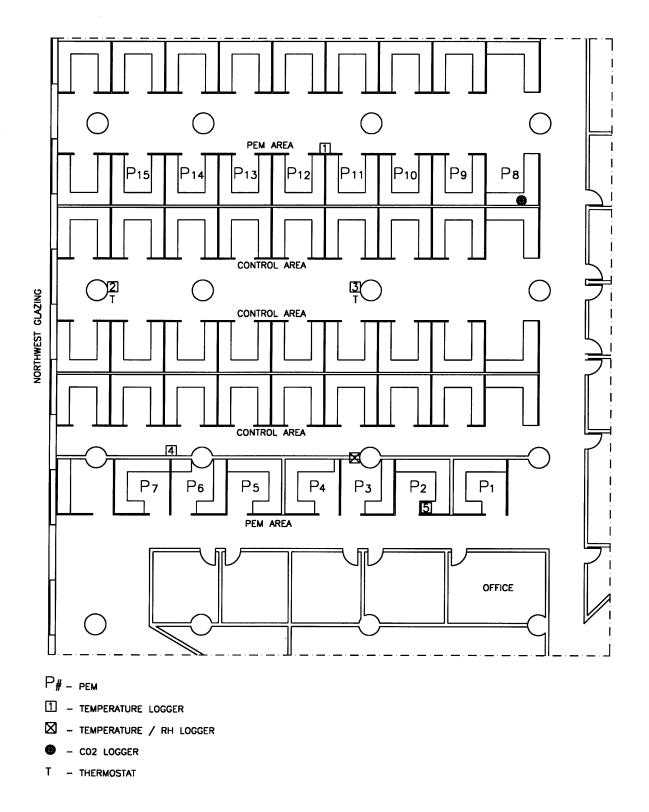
Floor Plan, PEM and Control Groups, 4th Floor of One S. Van Ness Ave.
